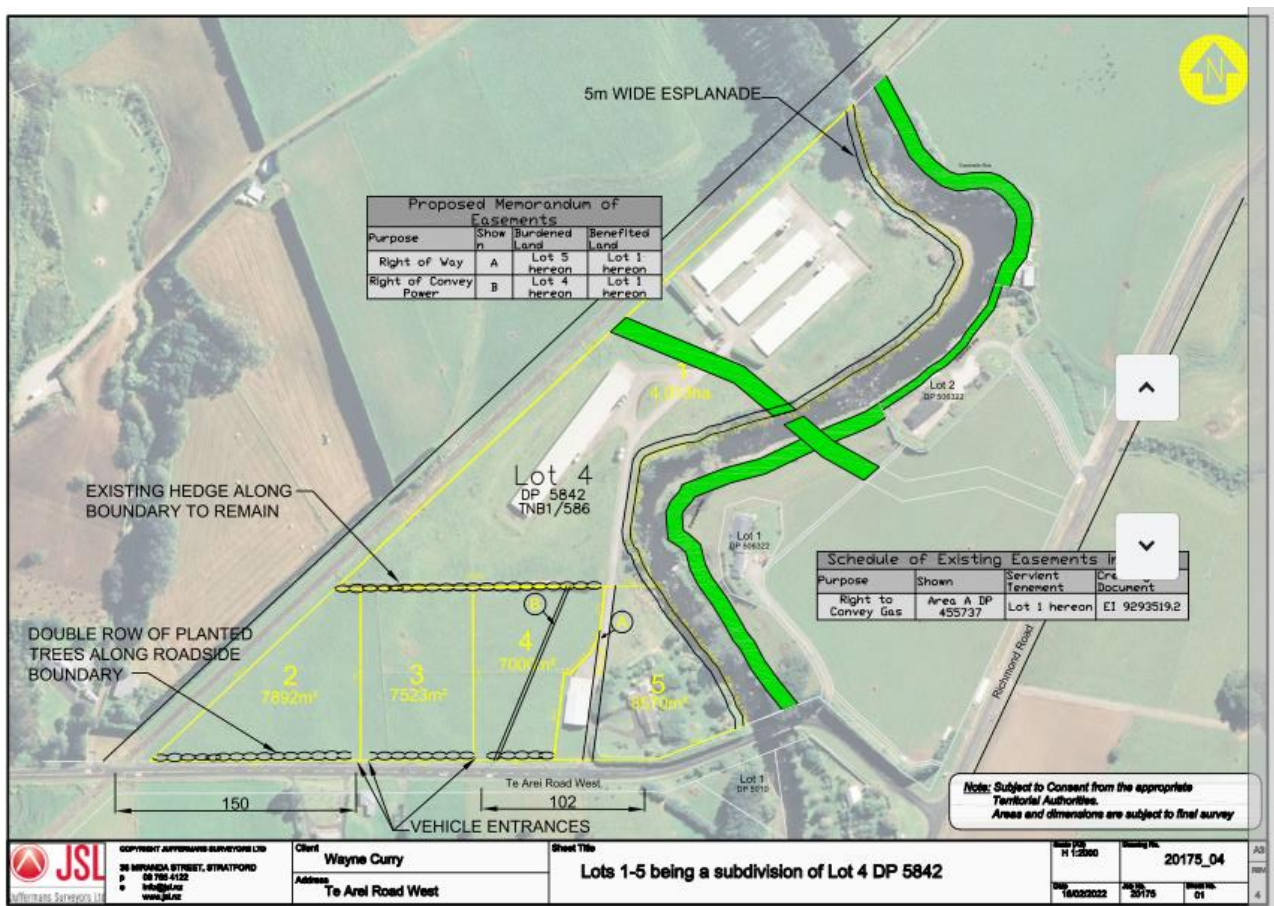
Scheme plan (Note: no updated plan was provided to show a 10m esplanade)
